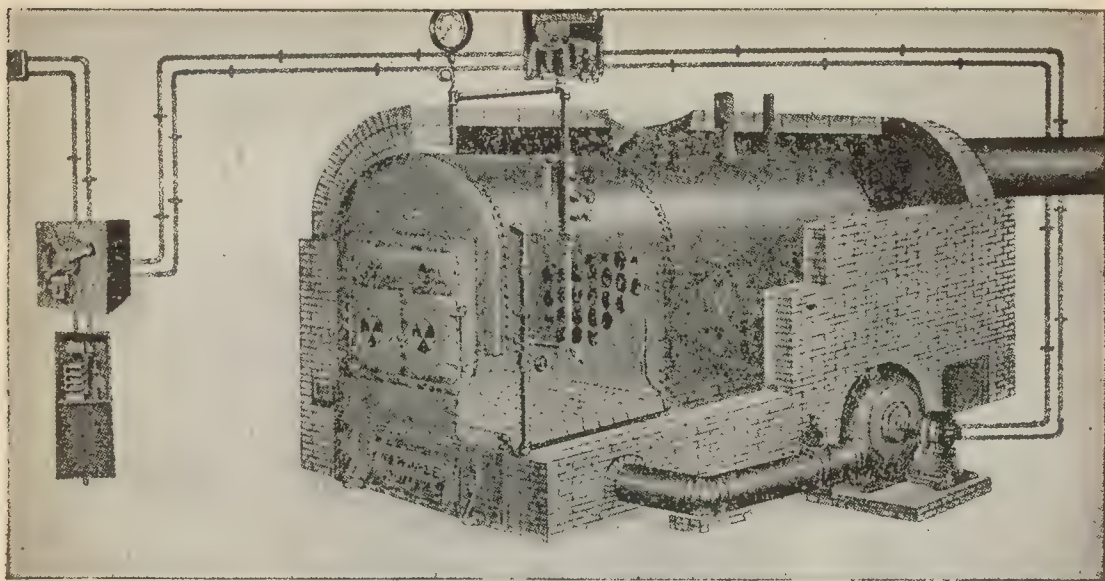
,645.—Premier forced draft water grate bars system; sectional view of boiler equipped with Premier water grate bars and blower connection showing method of forcing air into ash pit chamber beneath grate bars. Note brick wall used as grate bar rest, built inside of sealed chamber.
